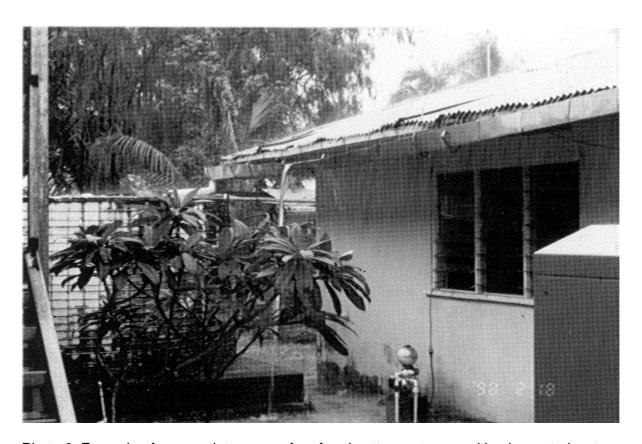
Example of poor maintenance of roof and gutter system resulting in wasted water.
